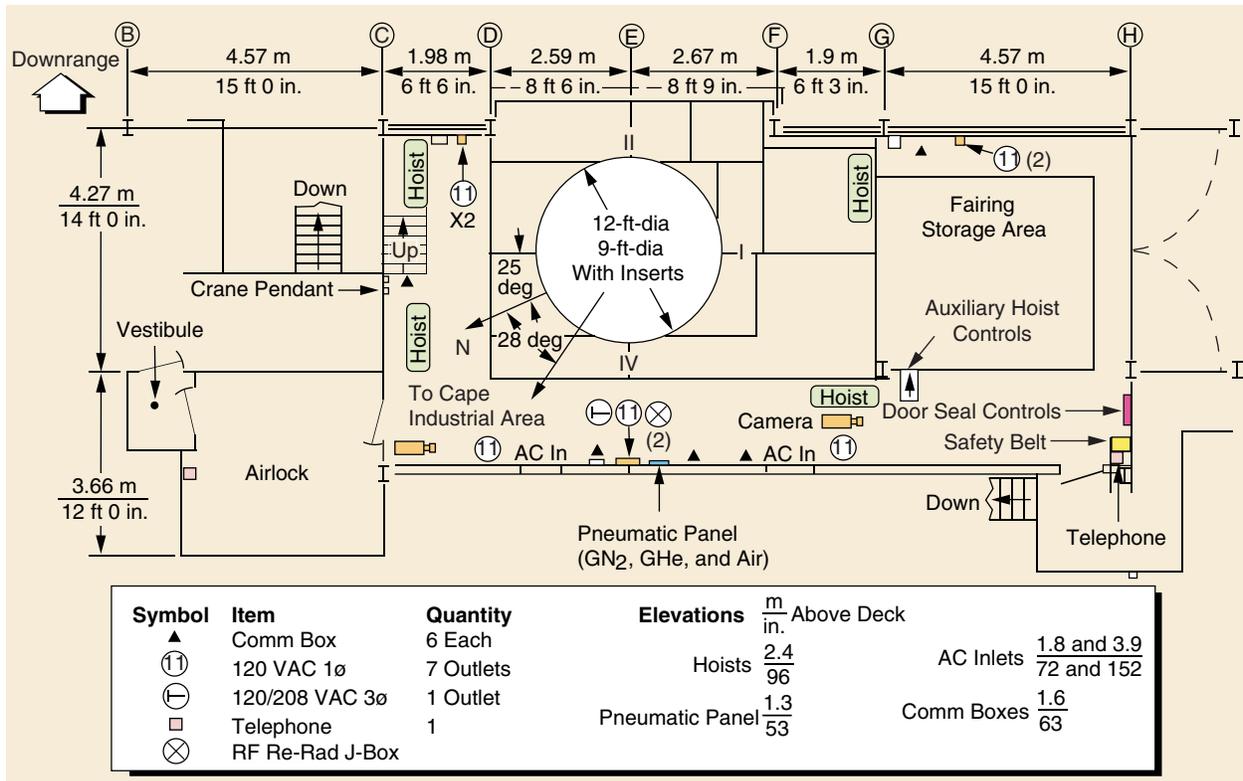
A. Level 9B Floor Plan, Pad 17A
